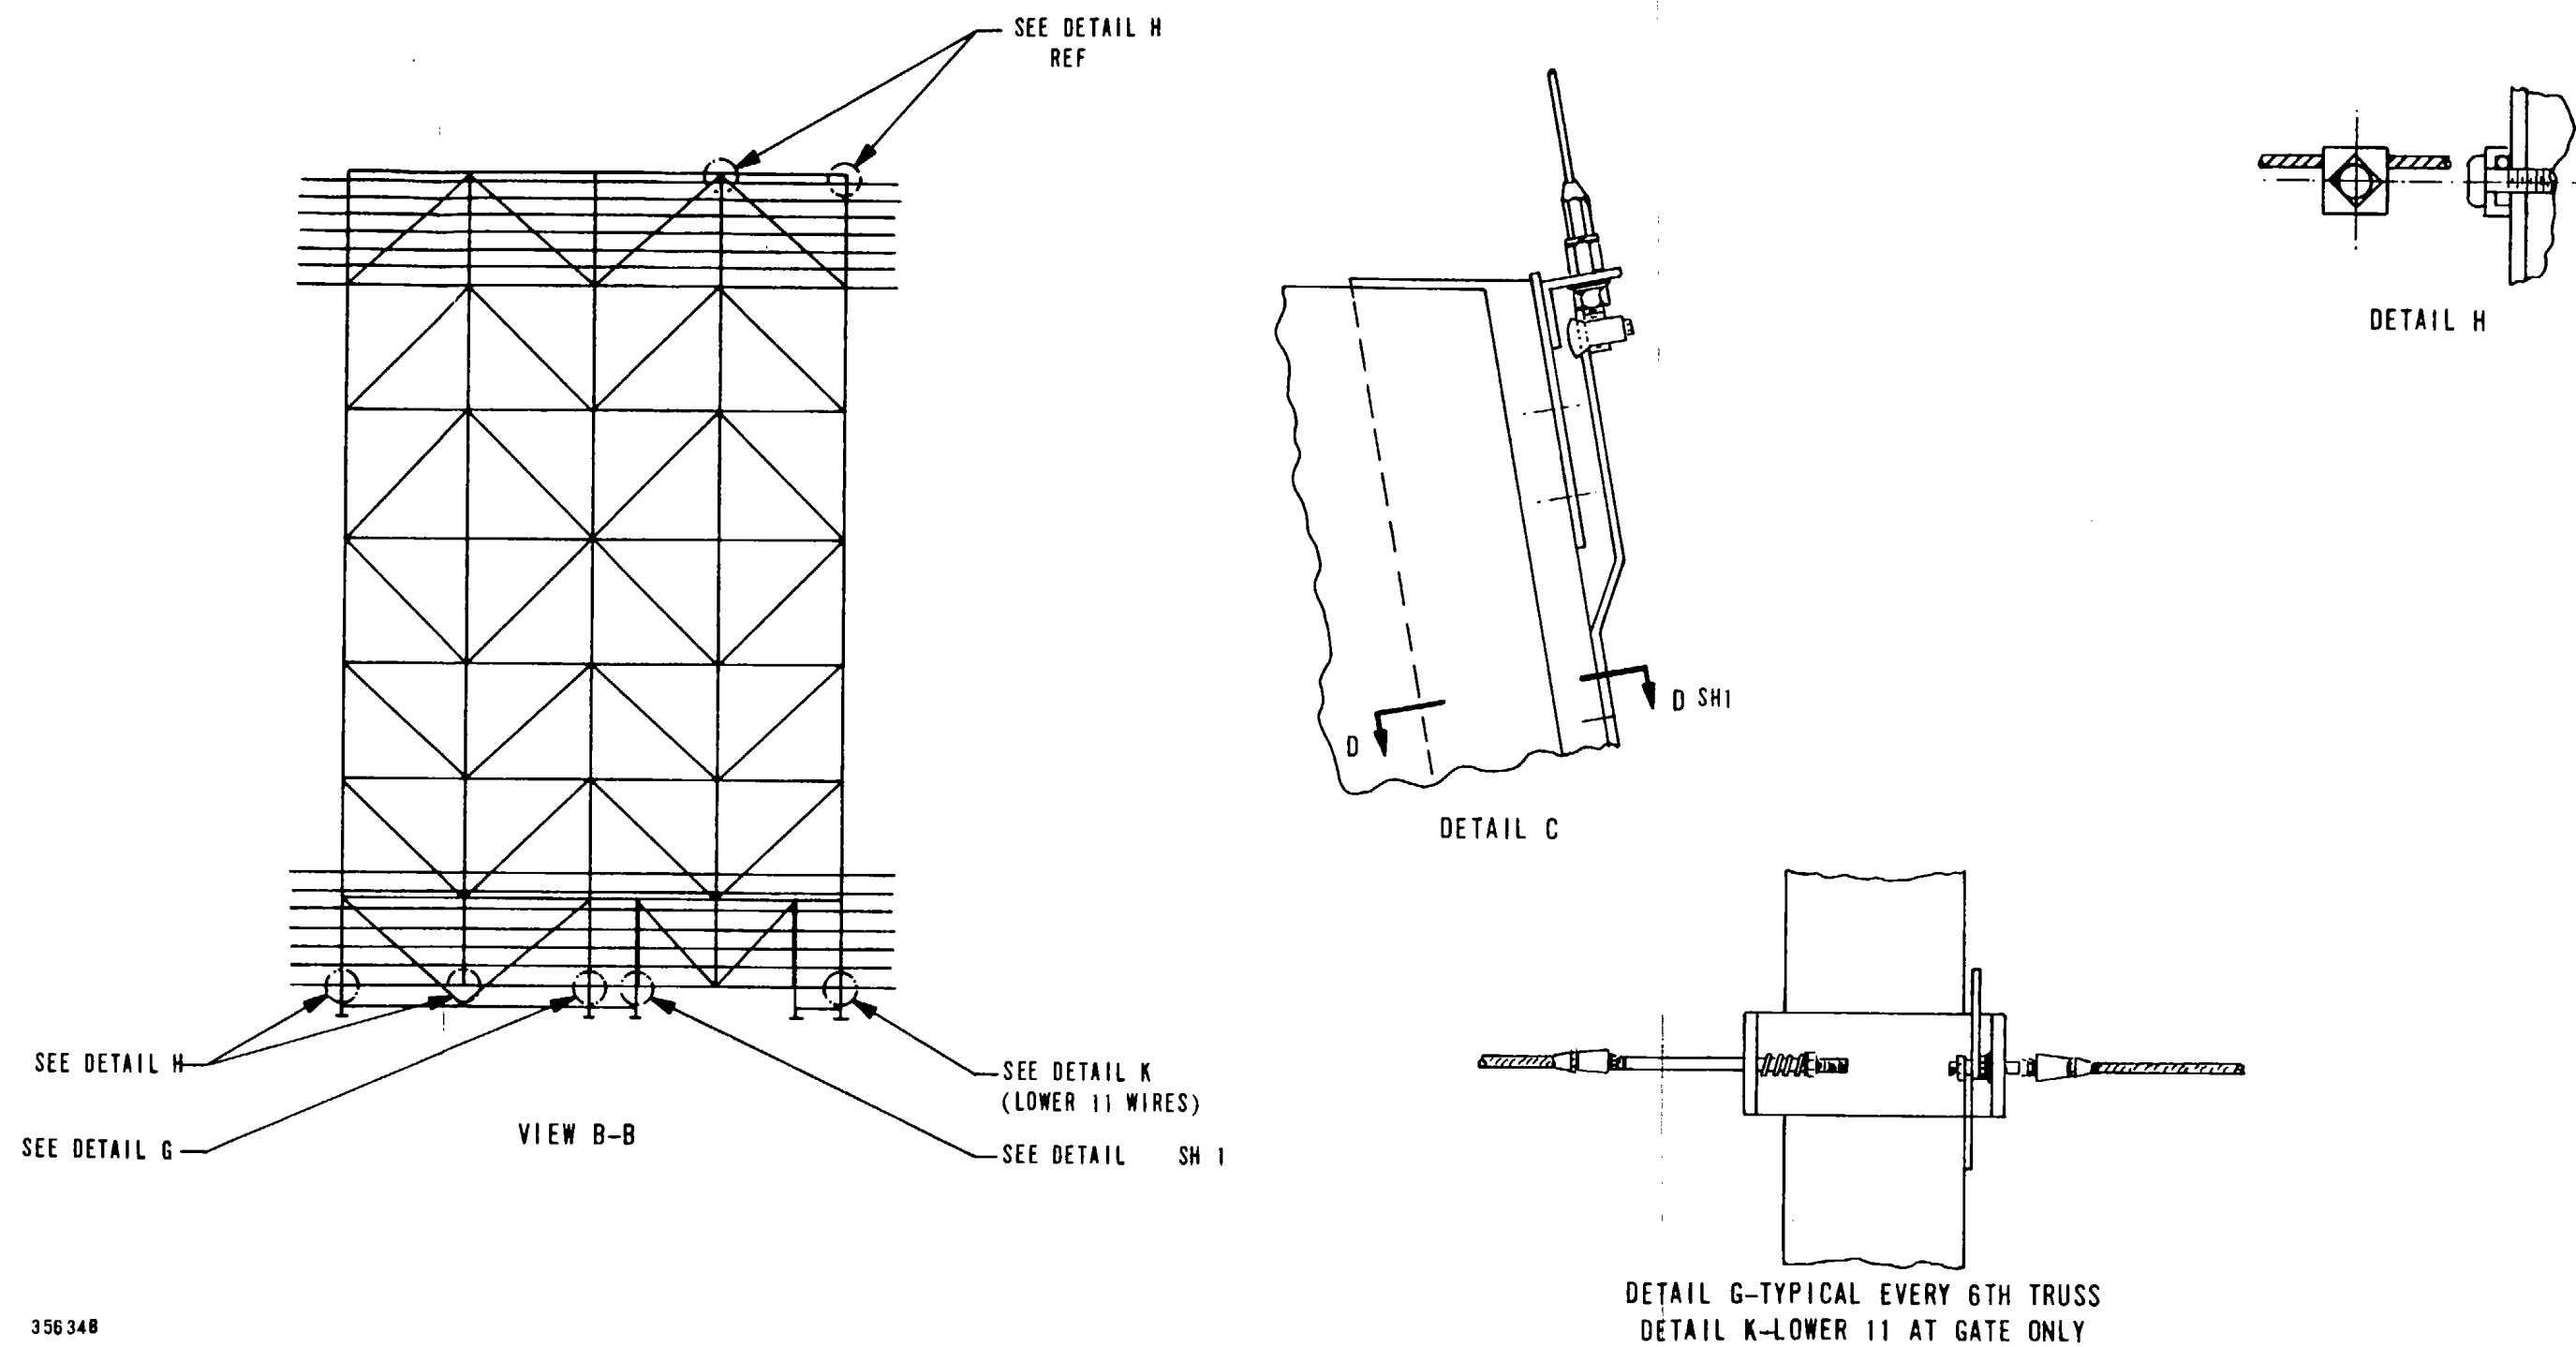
Typical Grounding Arrangement (Sheet 1 of 2)
